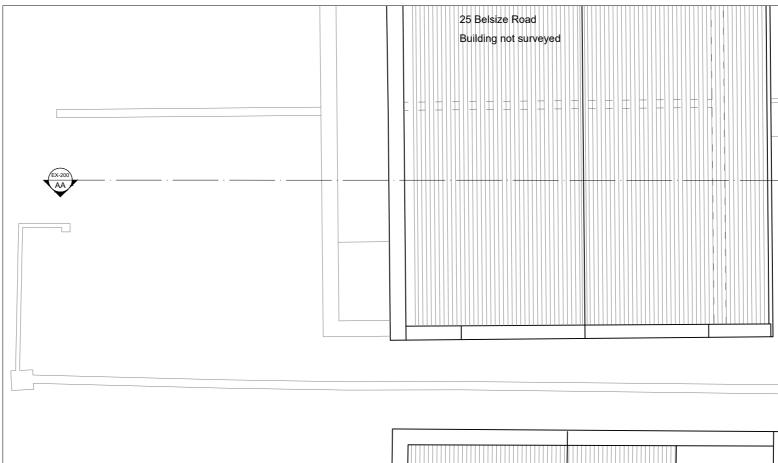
Existing Roof Plan - Scale 1:100 @ A3
